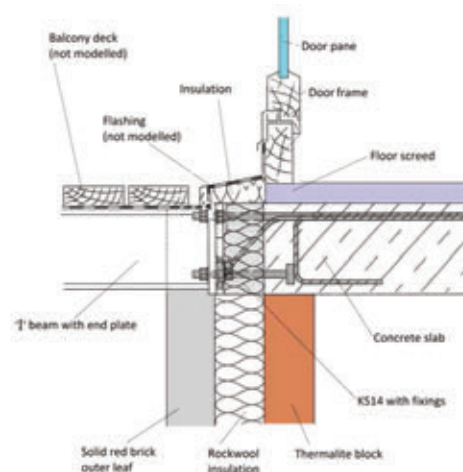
Schöck KS14 unit used with masonry wall and concrete slab
